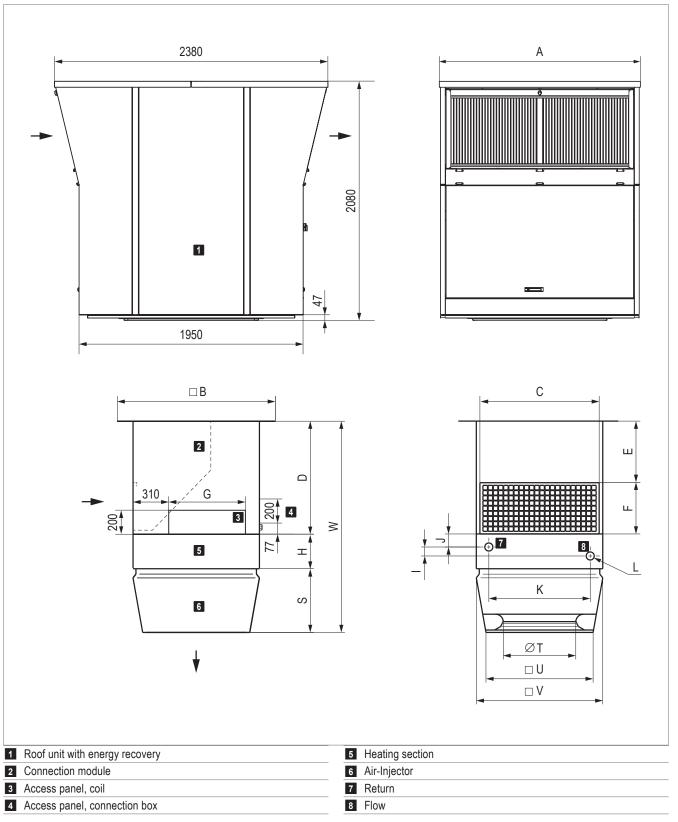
RoofVent® RH dimensional drawing (dimensions in mm)
